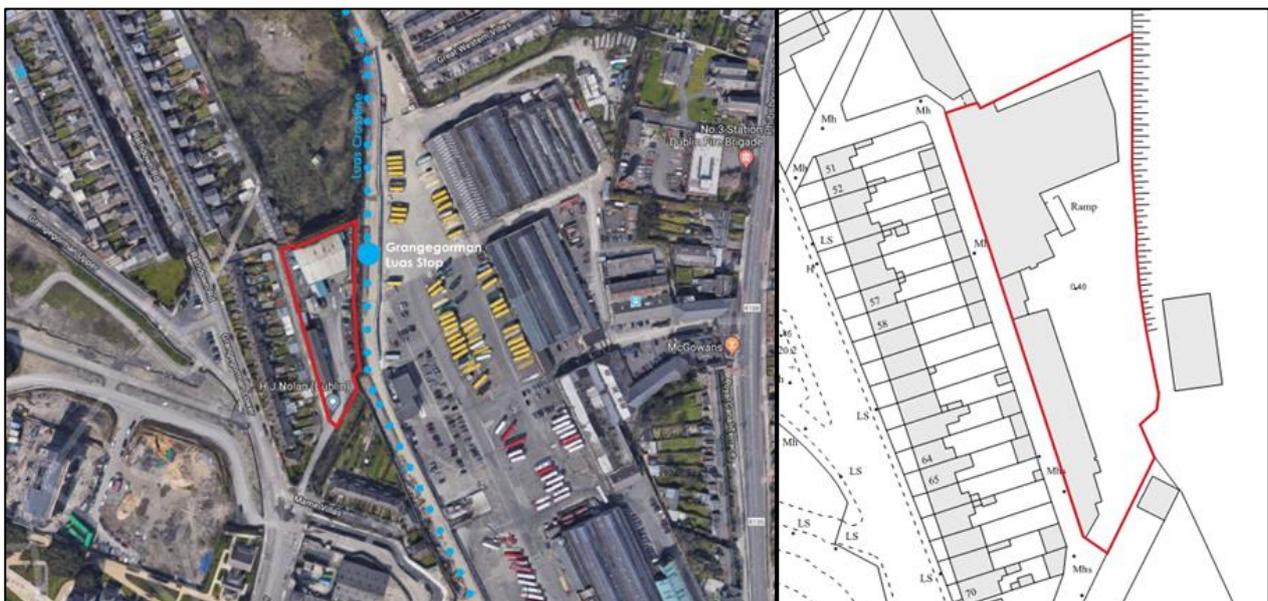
Aerial (left) and site plan (right) view of Rathdown Rd Student Accommodation development
